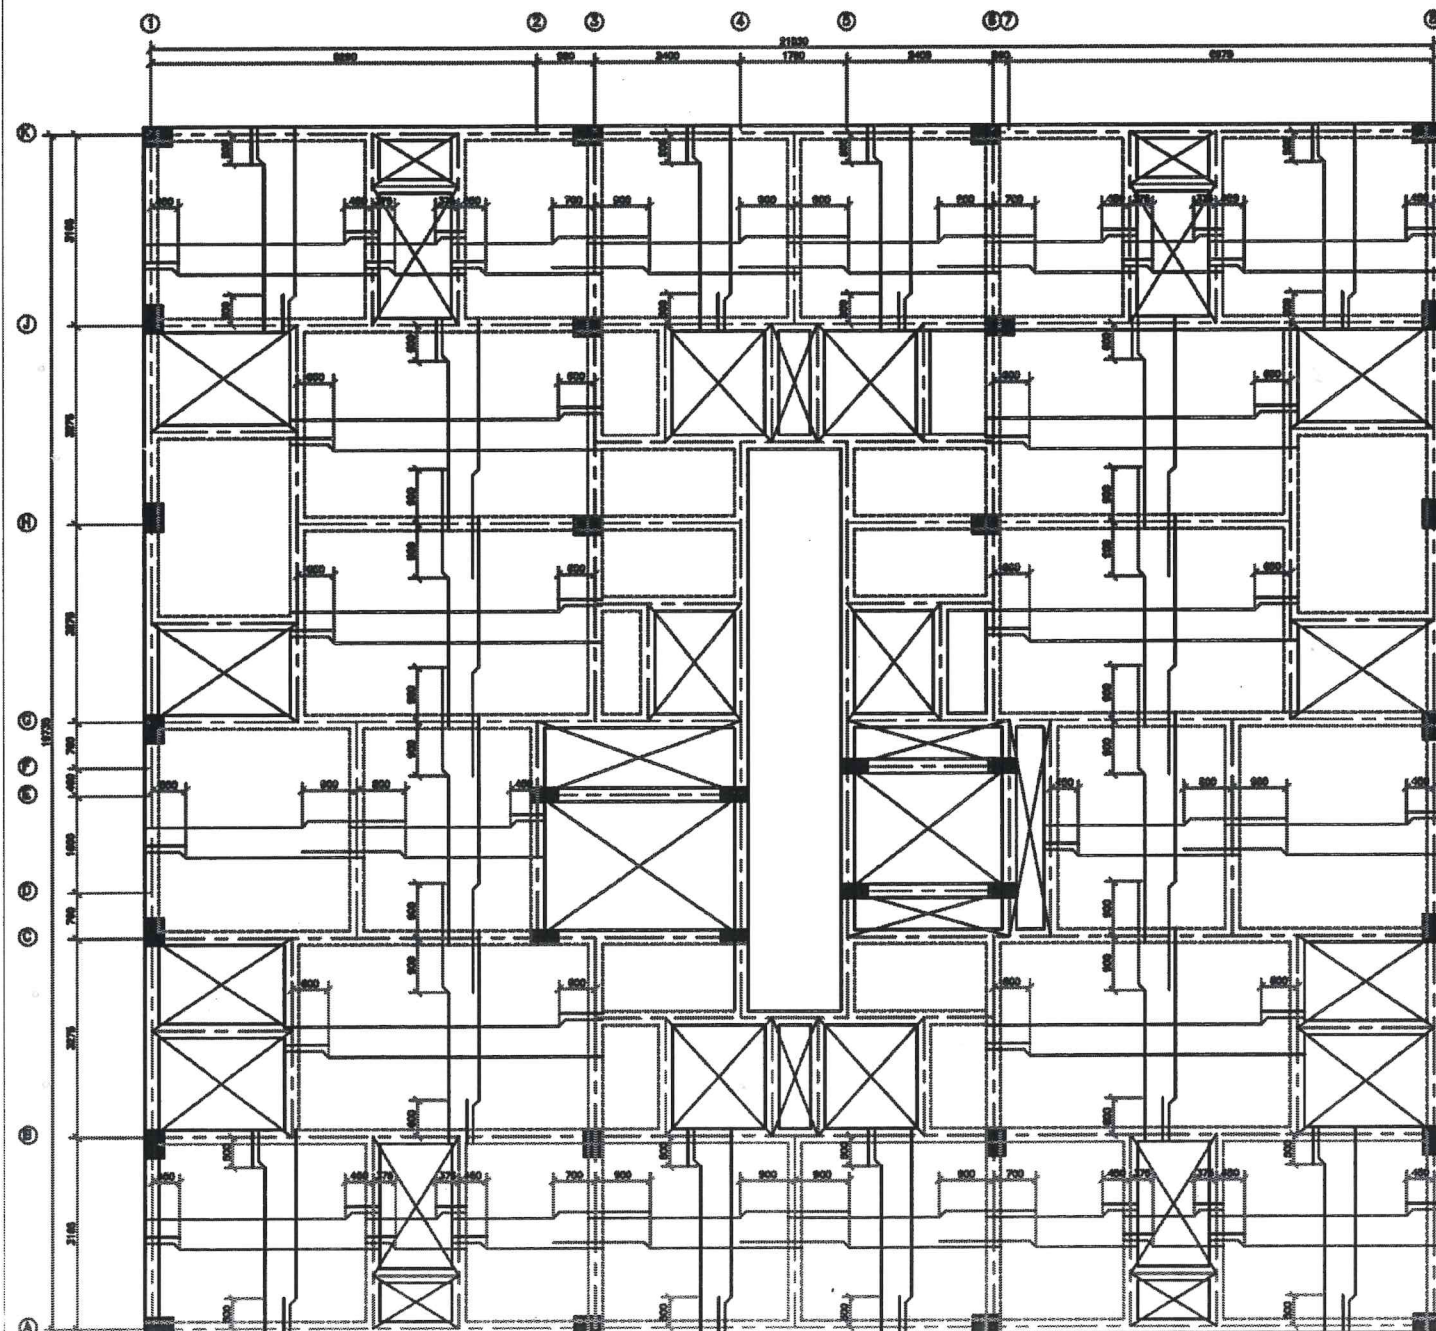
DETAILS OF ROOF BEAM IN ROWS A, B, J & K
